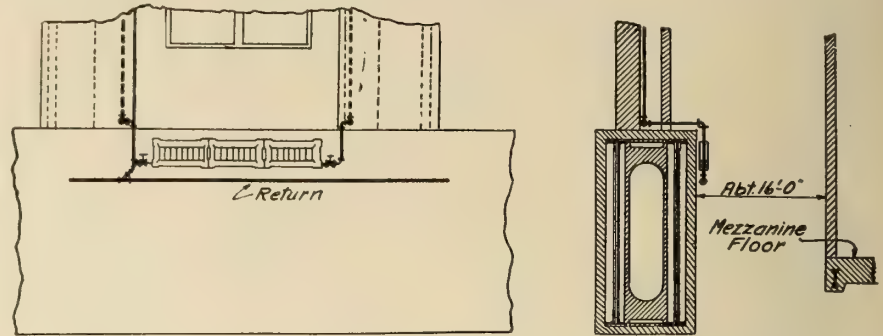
Typical wall radiator connections on east and west wall mezzanine.
